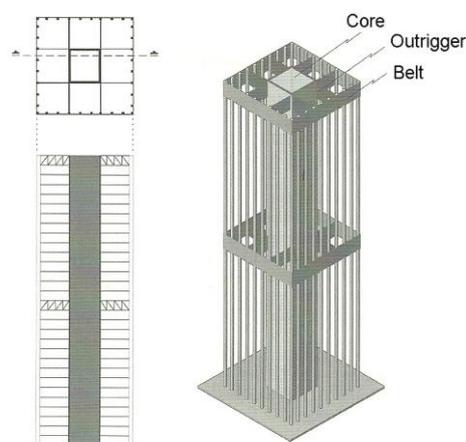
Outriggered Frame System (Source: Günel and Ilgın, 2010)
